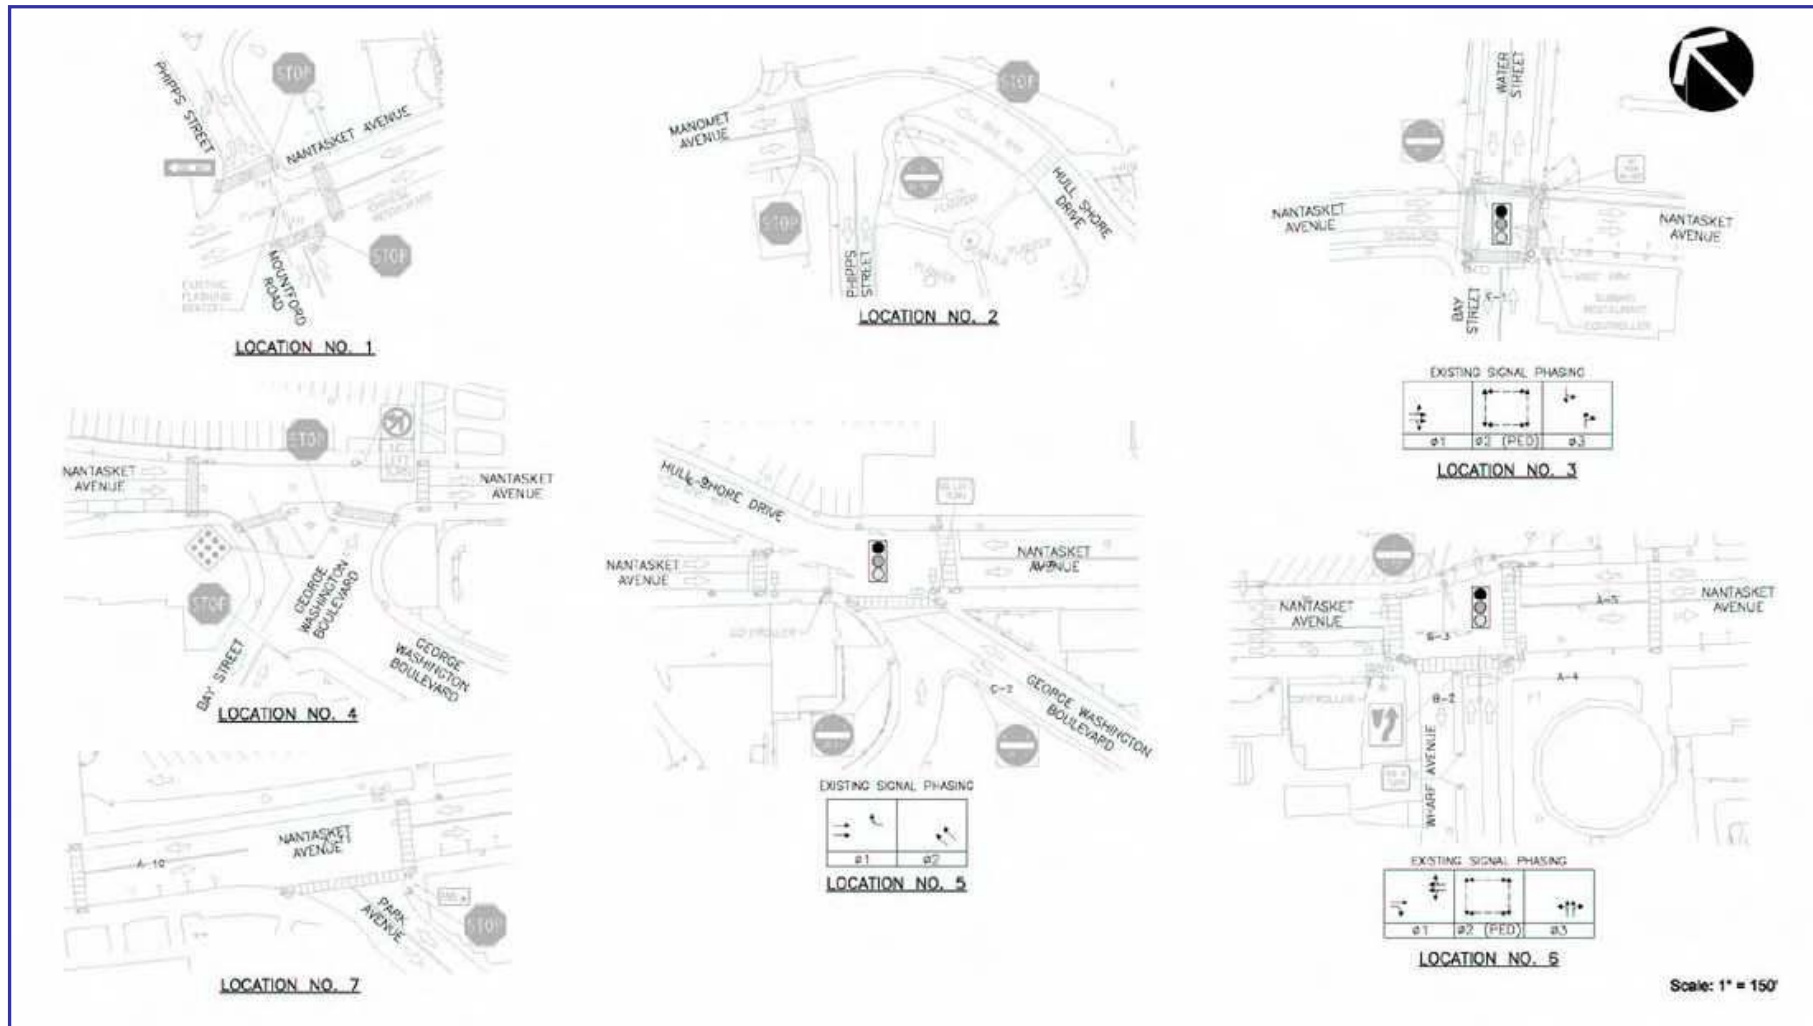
Existing Study Area Intersections – Geometry and Control
